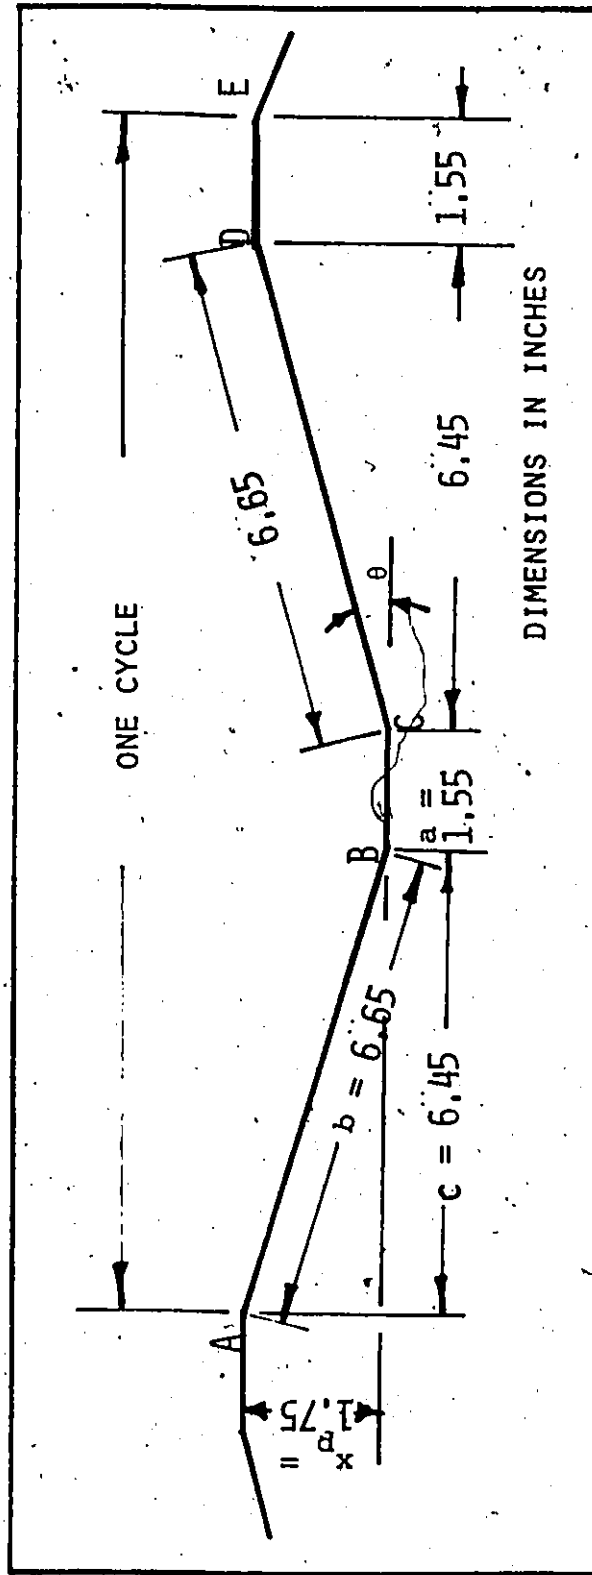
ARRANGEMENT OF ONE CYCLE OF CABLE IN THE LACED CONNECTION SYSTEM
